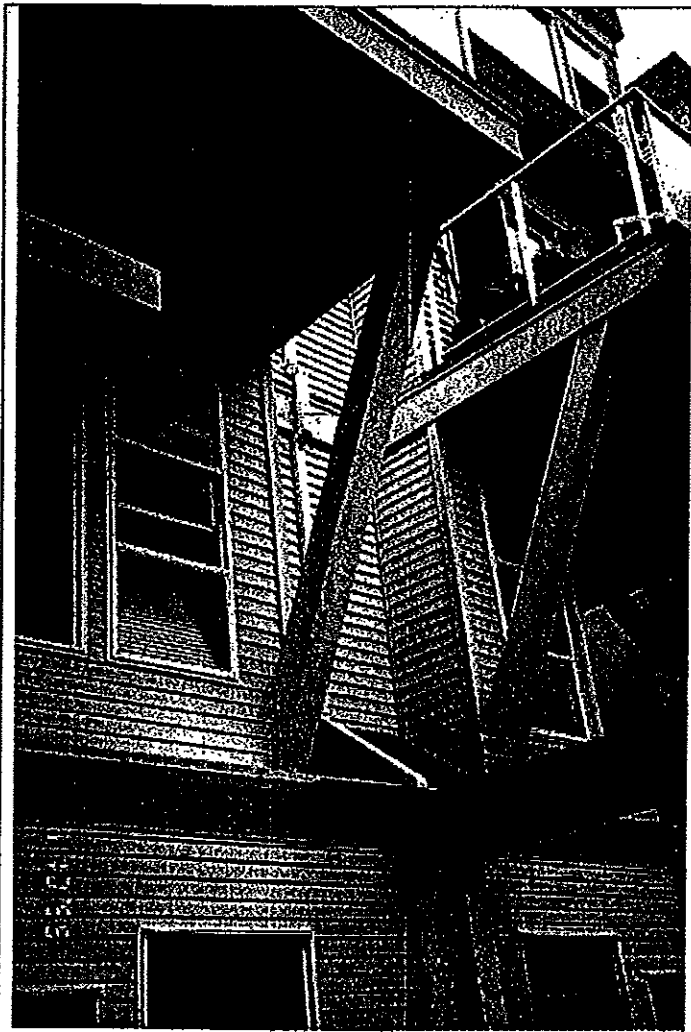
Building 1, south elevation. Typical location where balcony supports are anchored to the exterior walls.
